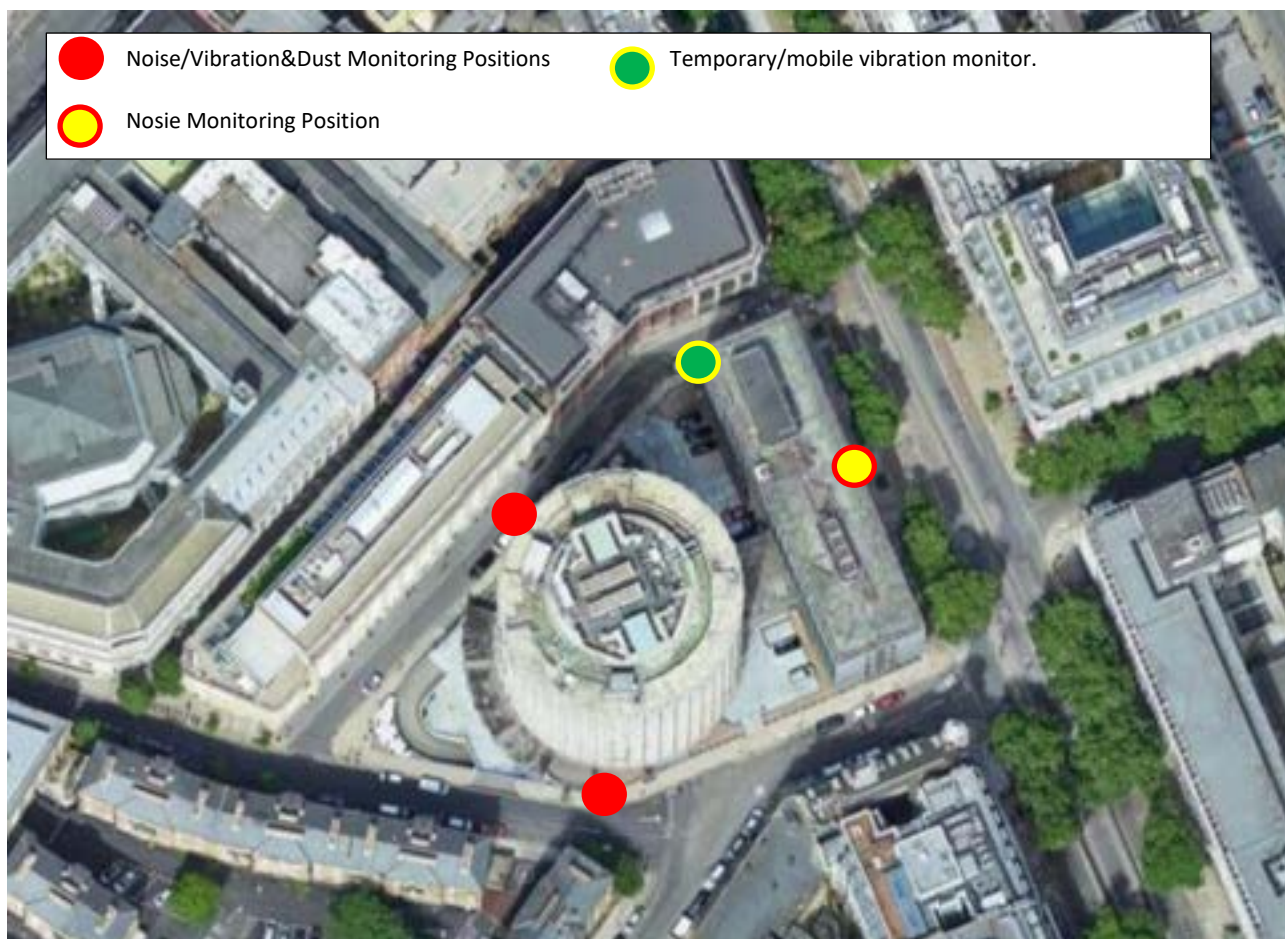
Site Plan – Indicative noise/vibration/Dust monitoring positions.
